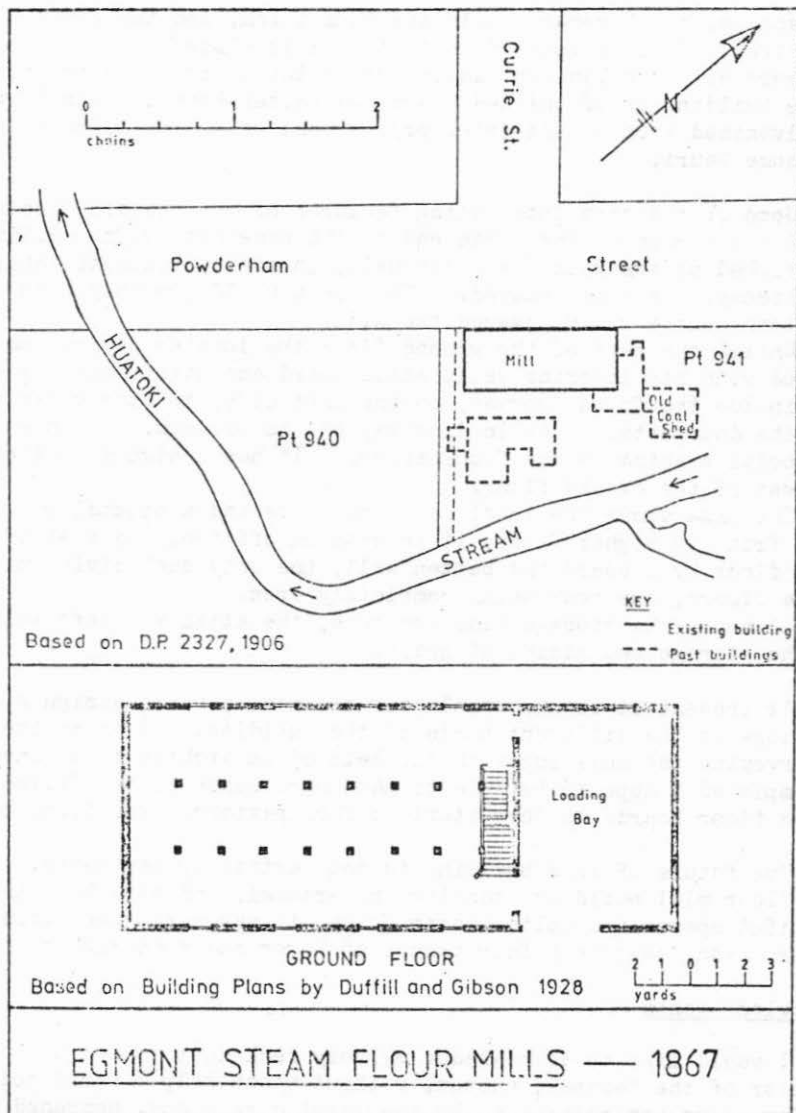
Location and ground floor plan of the Egmont Mill.
